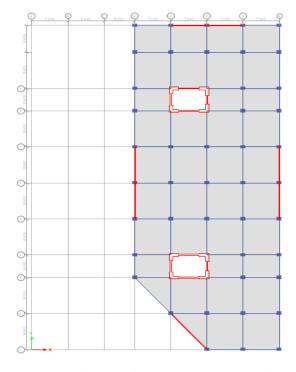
Typical Floor Plan: from 13 to 21 story level : Shear wall At middle portion
